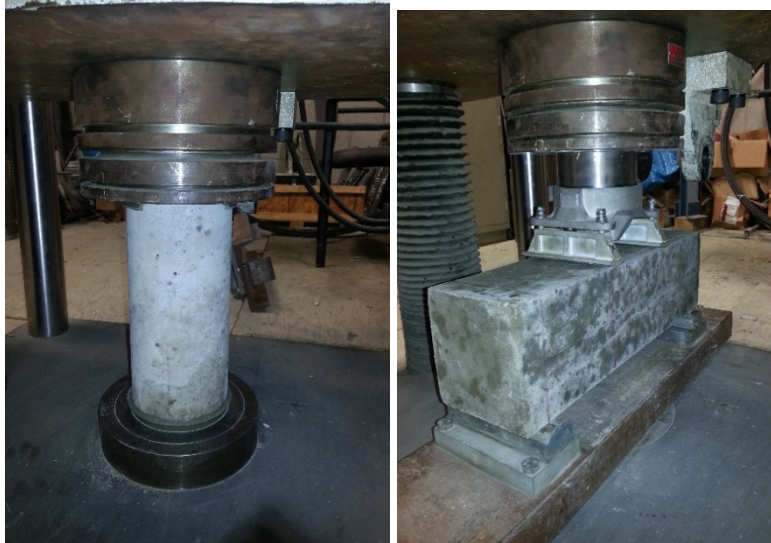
Test configuration for the compressive and flexural strength of concrete.
